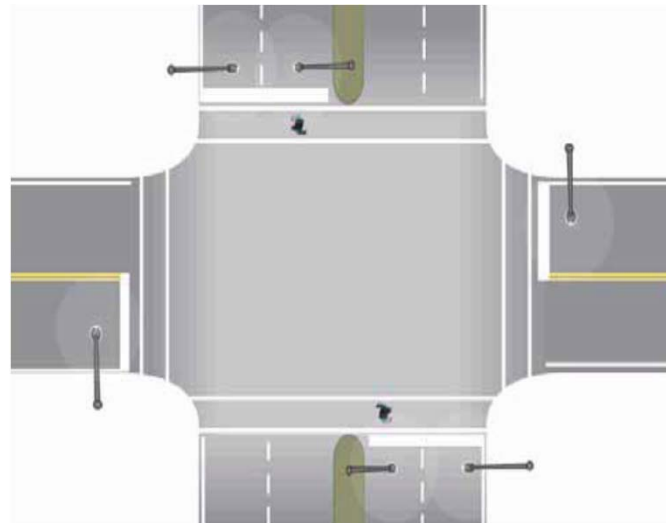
New design for wide roadway intersection lighting layout for crosswalks
